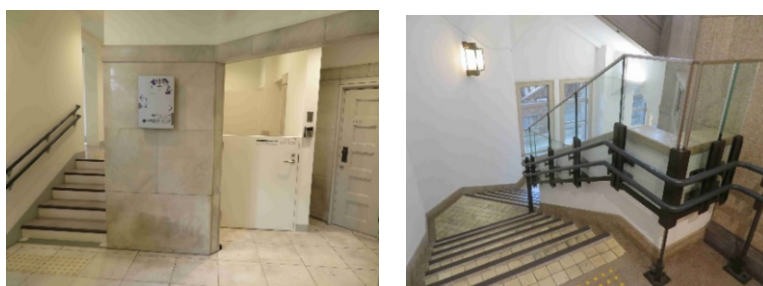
&b. Vertical lift at several places, and guardrail to prevent stair falls.
